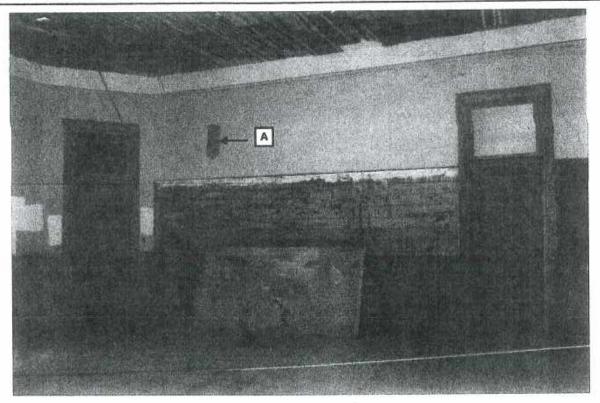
Room 15 view north. (A) Ghost mark of wall-mounted clock.
